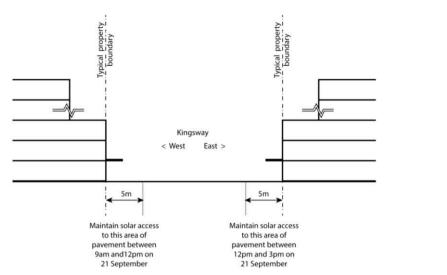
Solar Access: Kingsway between Railway Parade North and O'Sullivan Road
